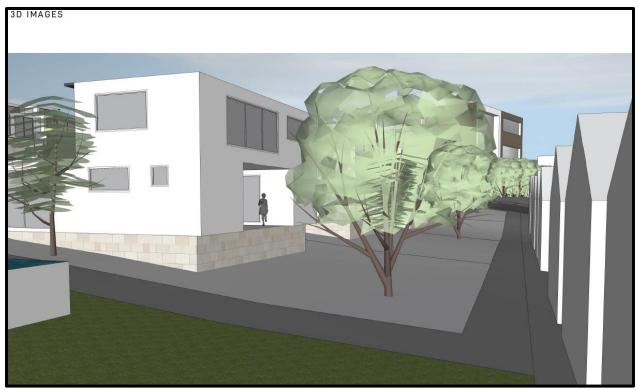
Concept Vision (Source: Robert Harwood Architects)
